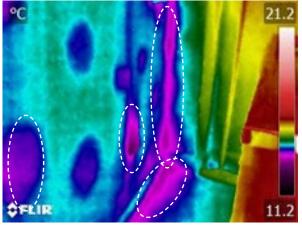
IR image showing heat loss through wall junction and plaster dabs.
